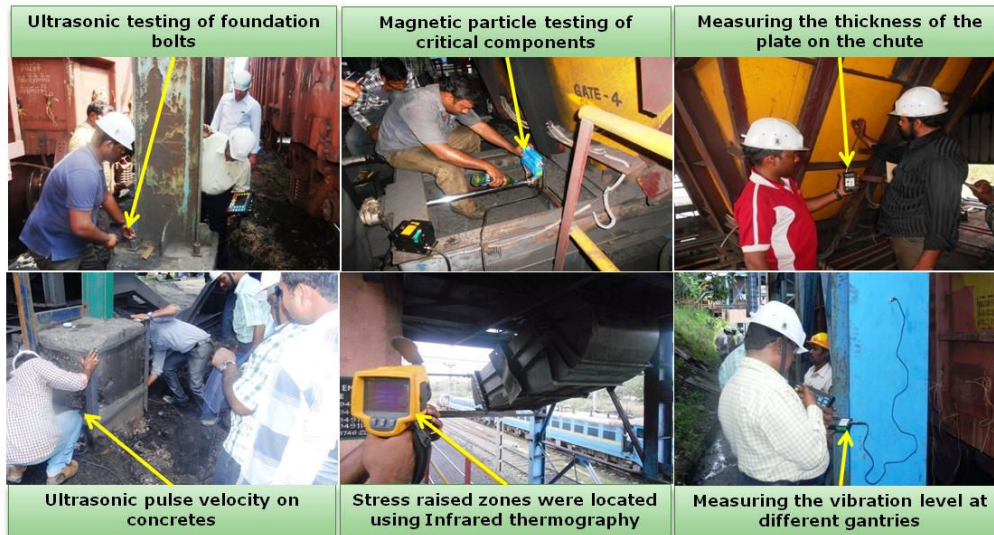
NDT on steel structures of Kondapuram Coal Handling Plant (CHP), Manuguru area
